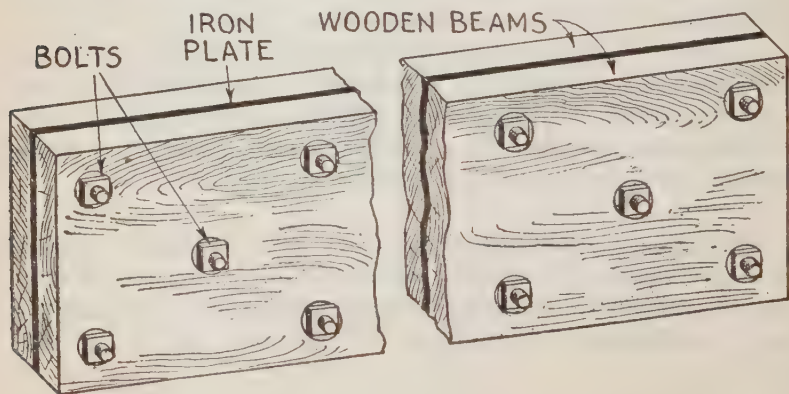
,795.—Flitch plate girder. It consists of an iron plate (called a flitch plate) bolted between two floor joists. This construction may be regarded as a substitute for an I beam.
